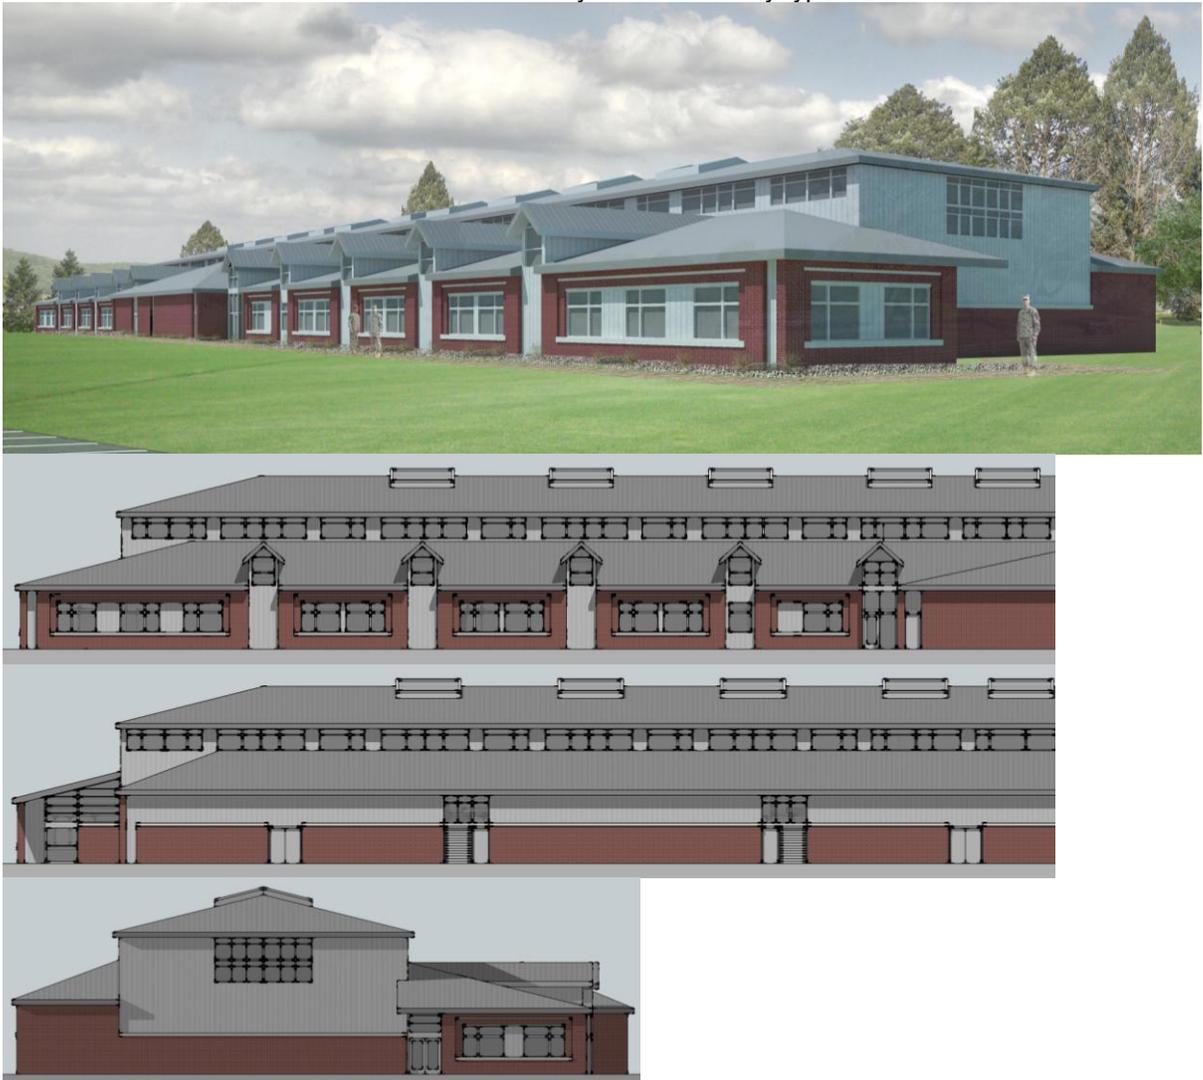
Architectural renderings of future DFAC within East Division district; perspective, front elevation, back elevation, left elevation, and right elevation
